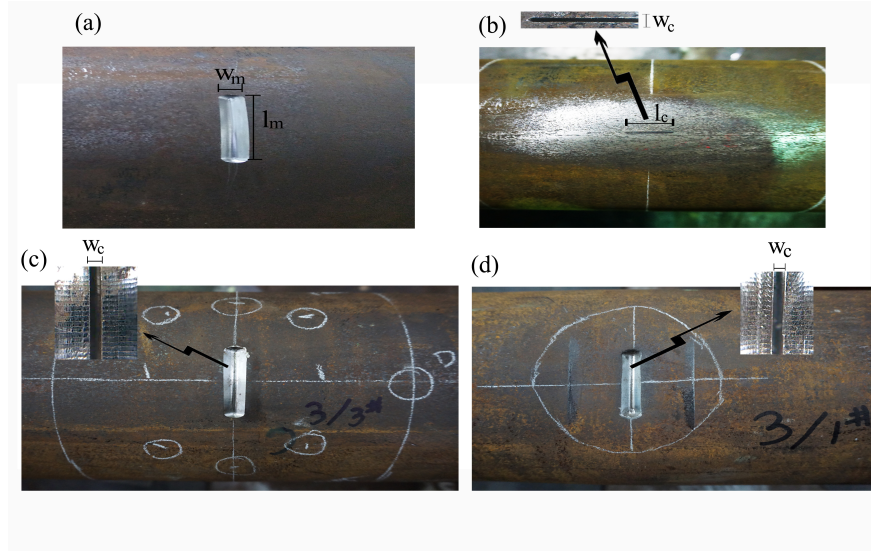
Photos of notch and crack damage on pipe surface: (a) single notch; (b) single crack (the crack can be seen from the zooming in area); (c) combined notch and crack (the crack can be seen from the zooming in area); (d) combined dent, notch and crack.
